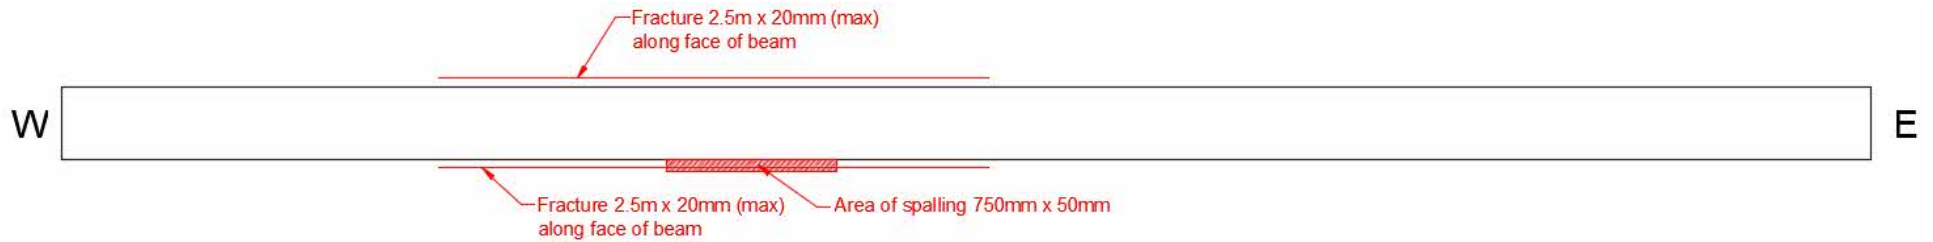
Plan View of Beam No.2 Defects (Photograph 8)
